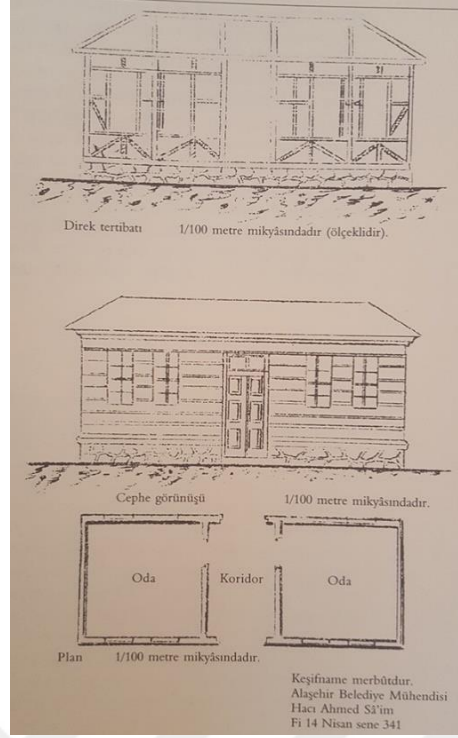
5. View of profile, facade, and plan of refugee houses.⁸³
